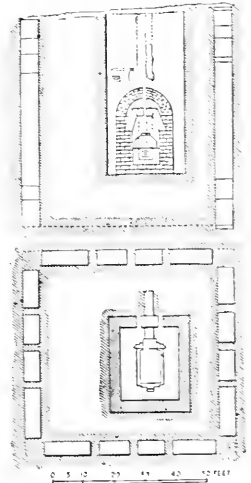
Campbell's Tomb; section looking west. From Vyse.
